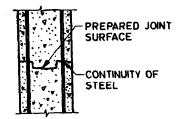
A TYPICAL CONSTRUCTION JOINT
